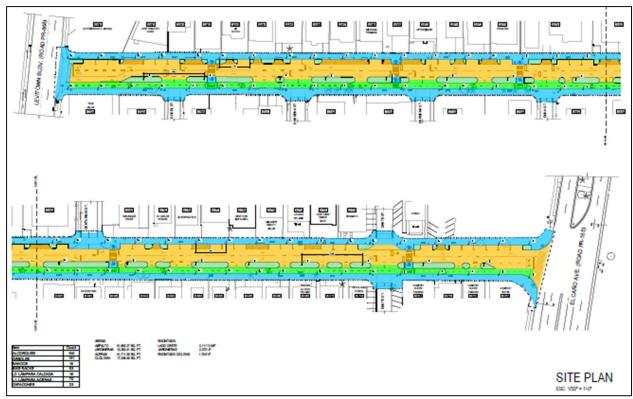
Site Plan Proposal – ROSSILUGO ARCHITECTURE
